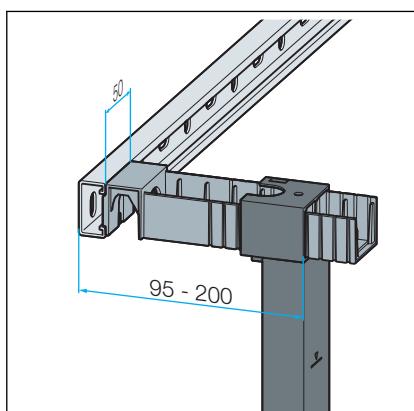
Maximum interval between Prevista Dry support bracket and Prevista Dry element
